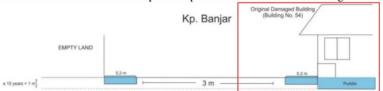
Spatial expression of inhabited damaged building (Source: direct observation, 2019)
